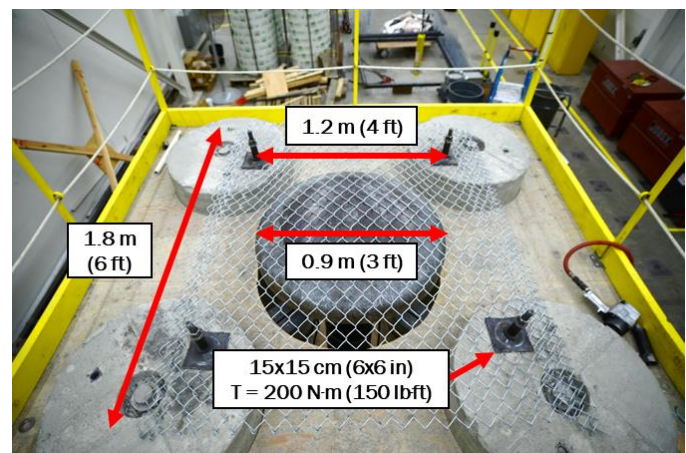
HEHD mesh testing setup and dimensions using chain-link fencing.
